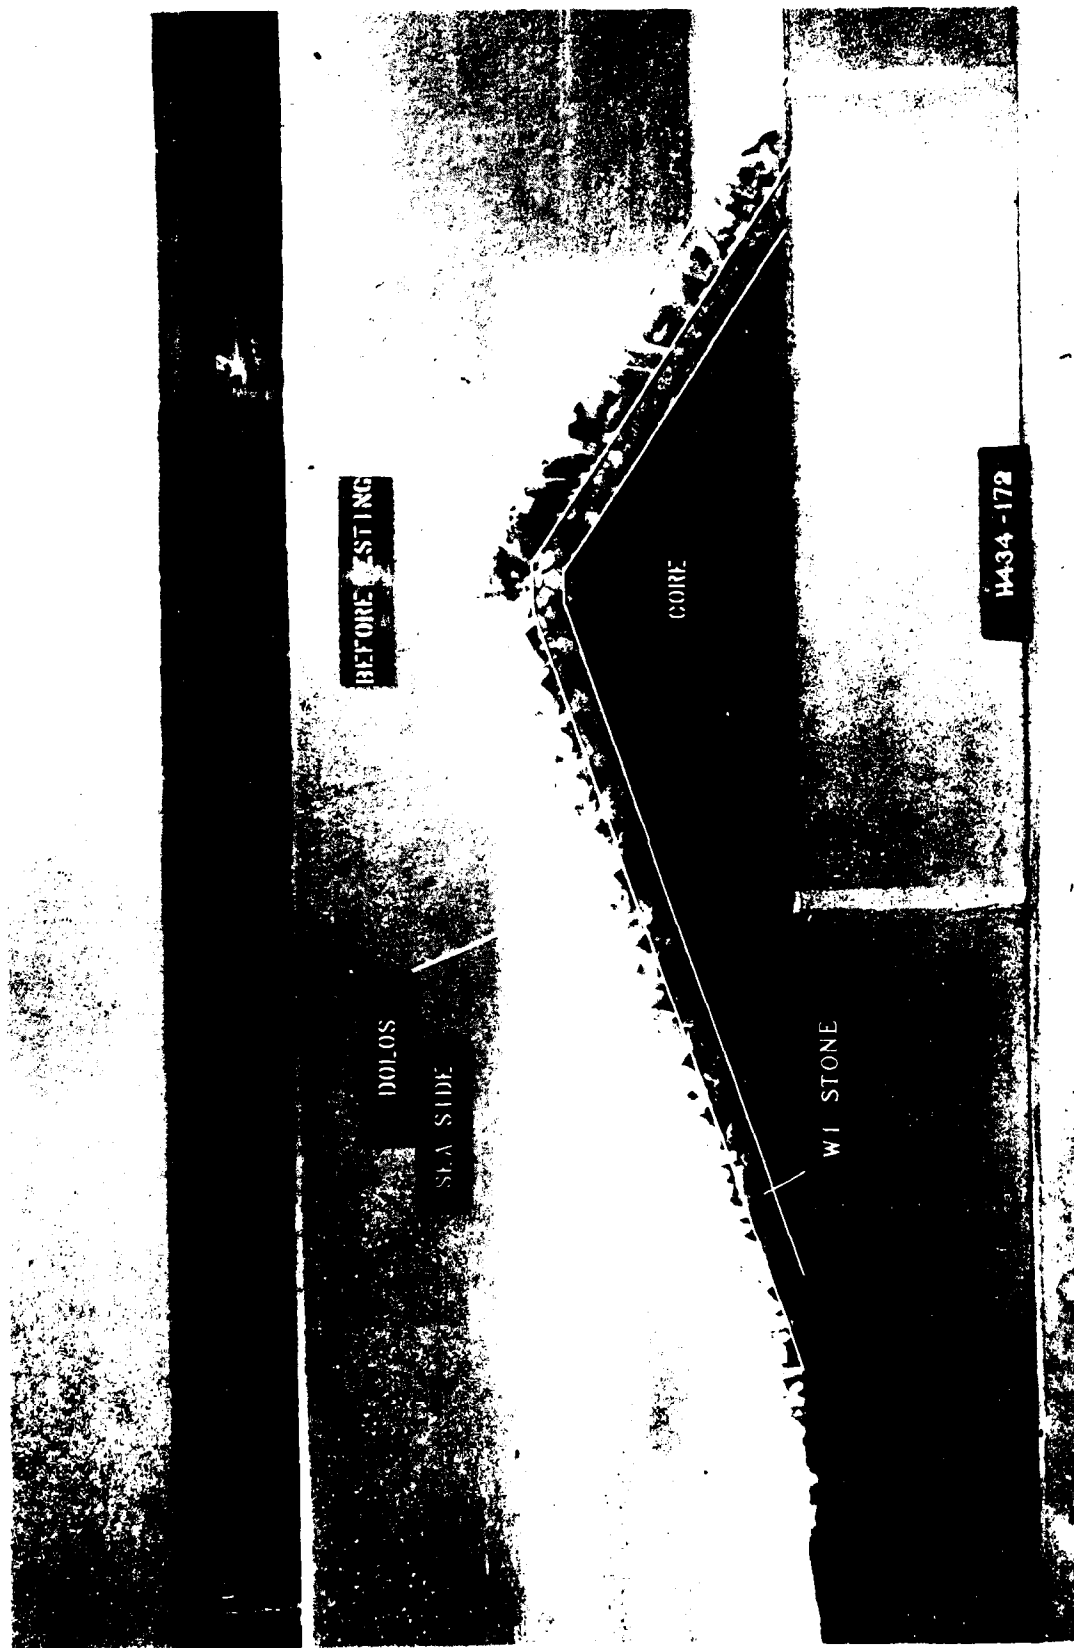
End view of a typical dolos section before wave attack at a LV-on-3H sea-side structure slope;  $W_a = 0.276$  lb
